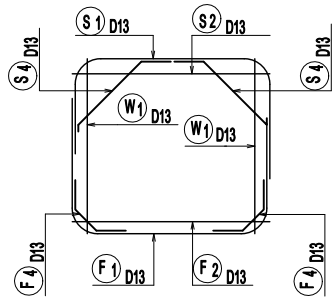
DETAIL OF BOX CULVERT (1) BAR ARRANGEMENT OF BOX CULVERT S=1:50
